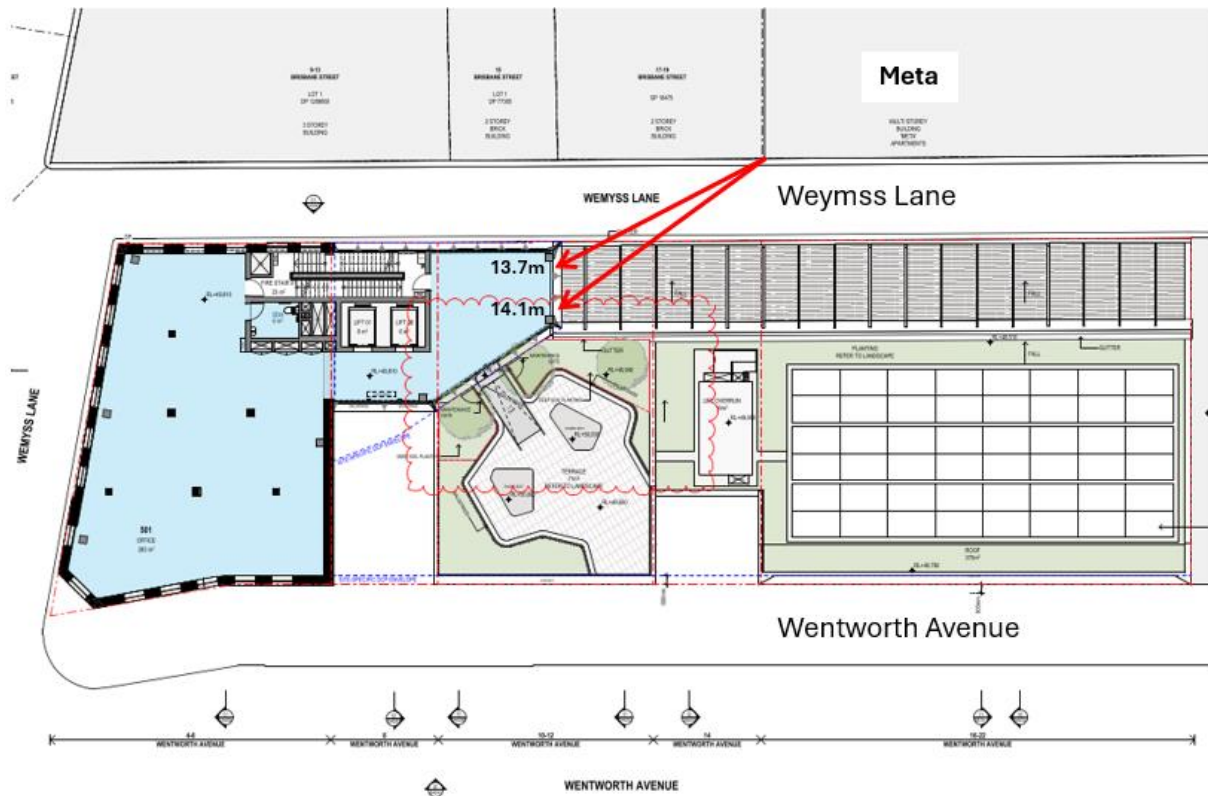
Proposed level 5 plan. Separation distances between Meta Apartments and the tower are indicated.
